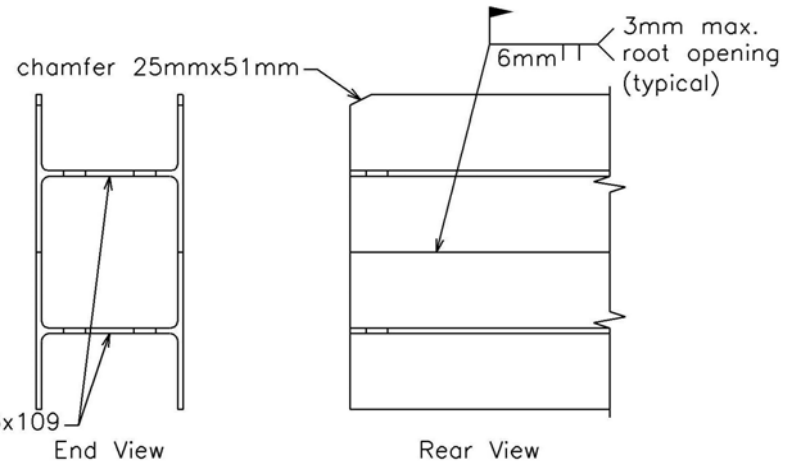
Steel H-section Temporary Barrier Design Details (Design No. 2)
